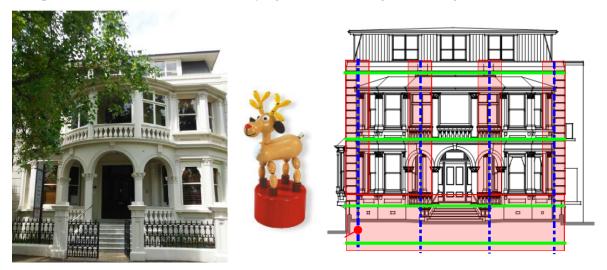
Seismic retrofit of unreinforced masonry building using un-bonded post-tensioning.
